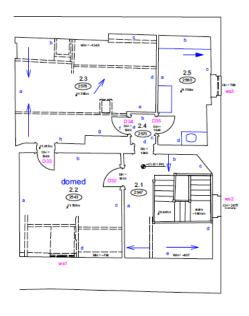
Second Floor/Attic in plan, scaled. c/o Maybank Building Conservation
